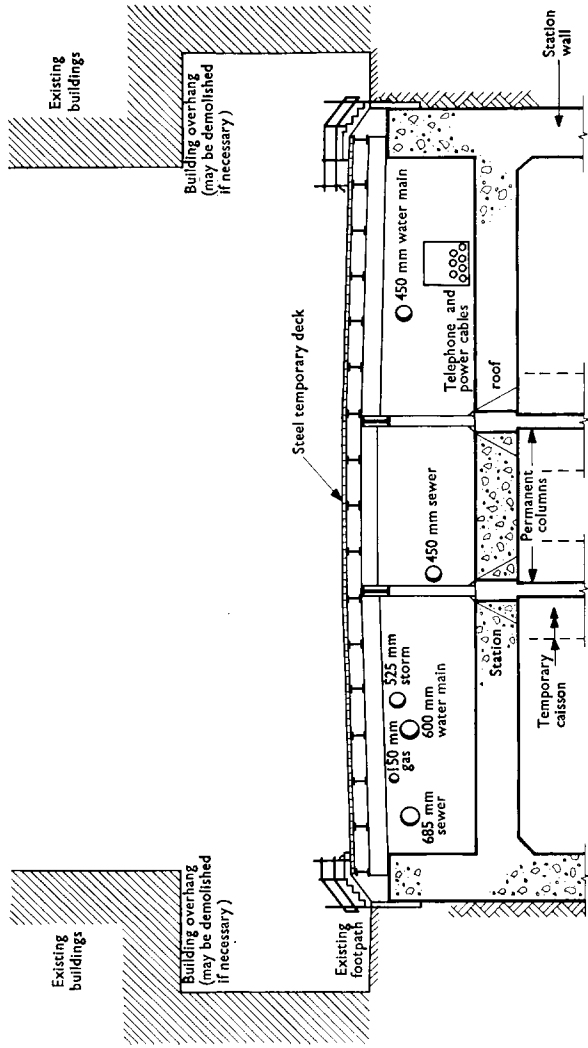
Station construction under Nathan Road showing frontage line, overhang of buildings and present location of utilities ; also temporary works proposed to permit building of station by cover-and-cut after construction of diaphragm walls to form the station walls
